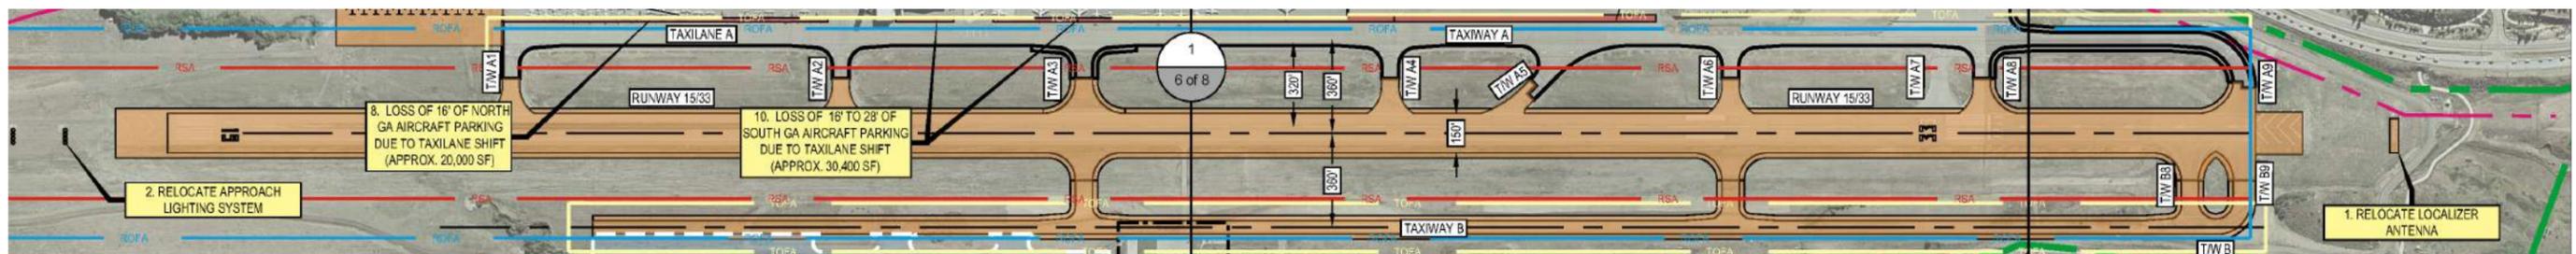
Existing West Side Infrastructure Impacts (Appendix C, Alternatives 7 and 7a, Sheet 1 of 10)
